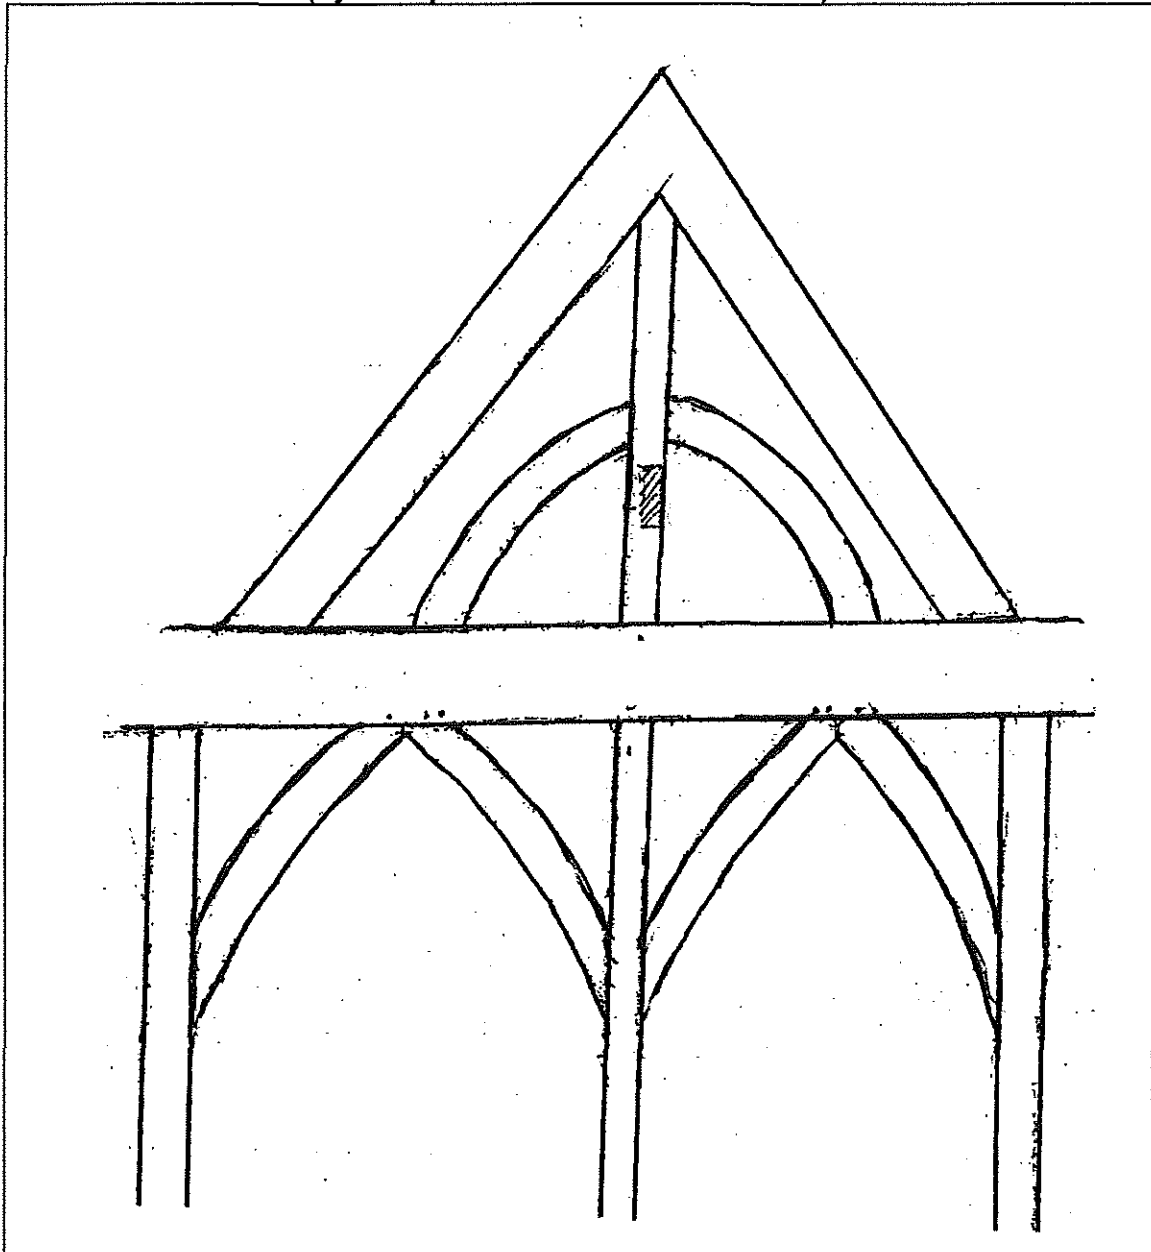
Drawing showing truss 5 (central truss) of the open hall range to show sample positions
